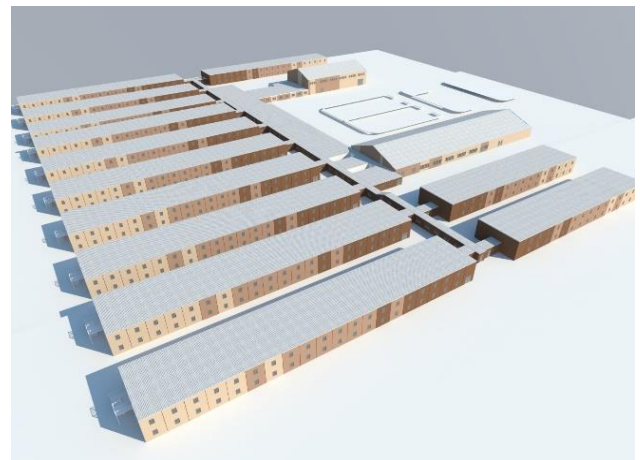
Mining camp floor plan and geometry of the base case in Sketchup + Openstudio (Tecnofast, 2012).
